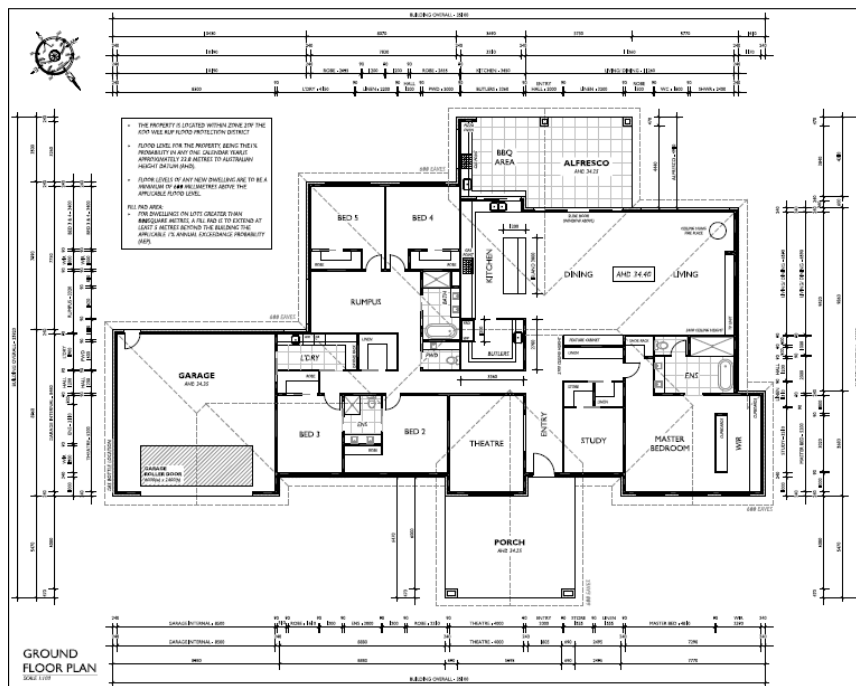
Extract Floor Plan Jackson and Fapio Pty Ltd
